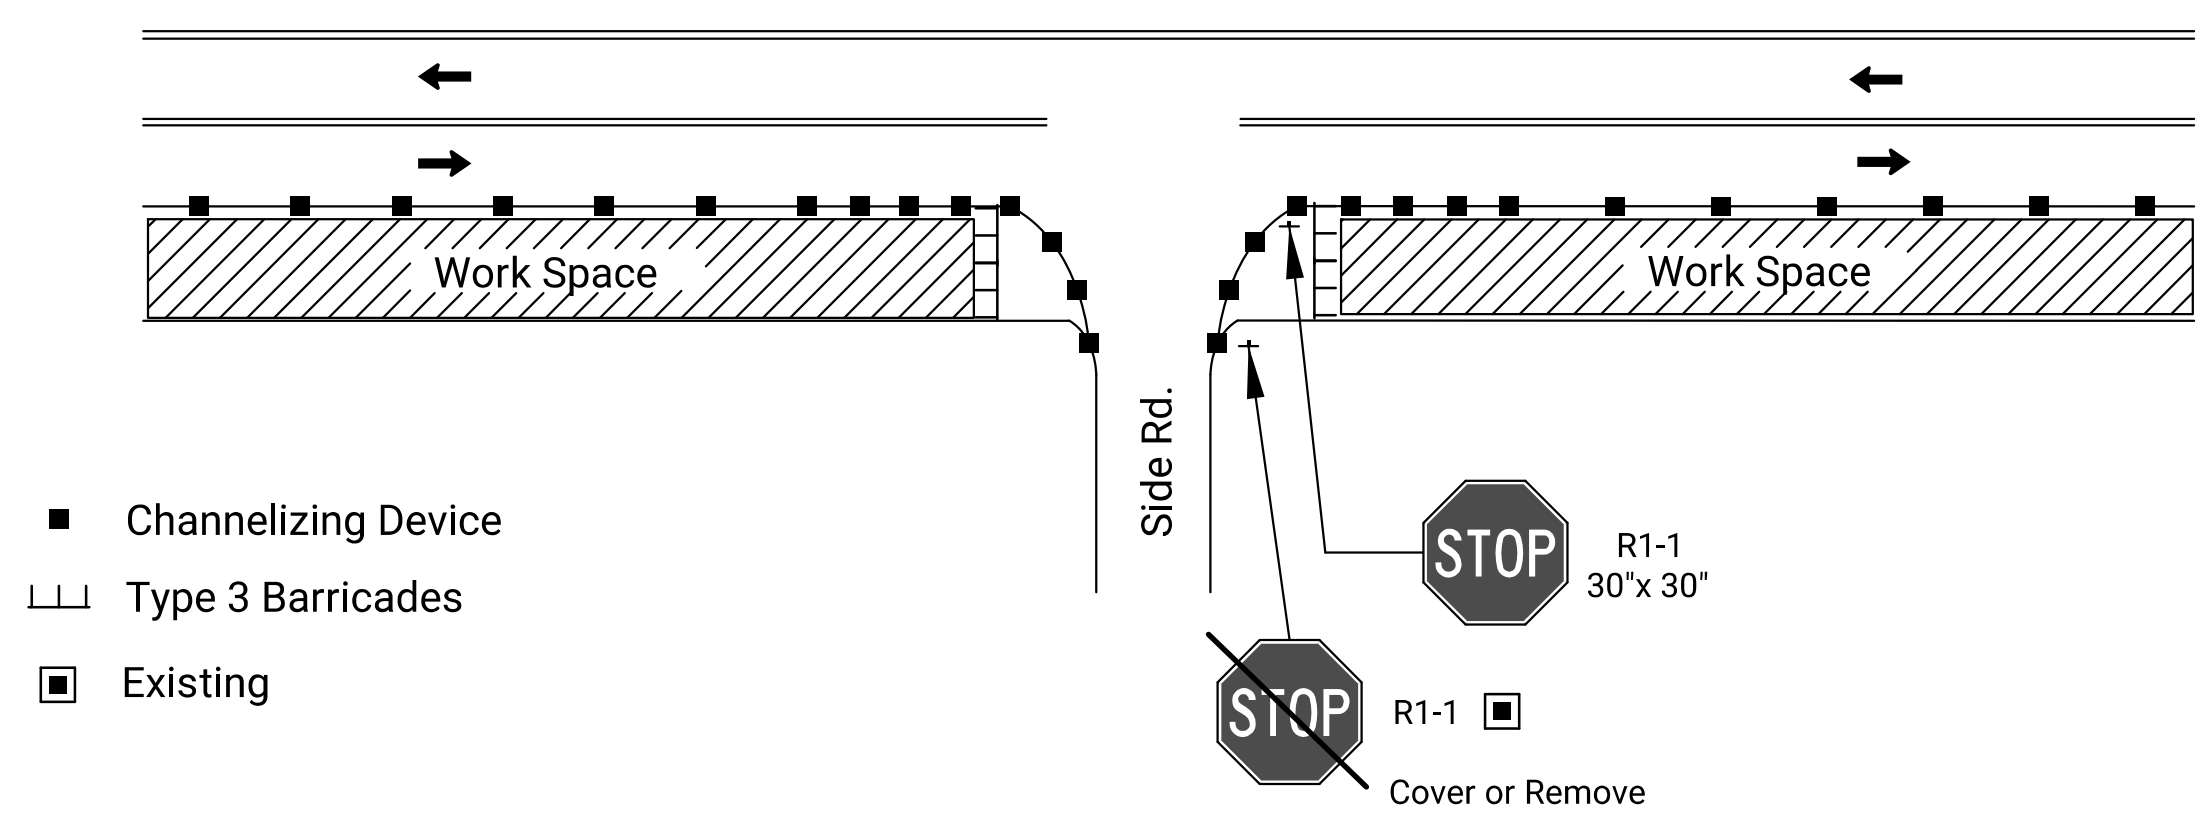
SIDE ROAD OR ENTRANCE OPEN THROUGH WORK AREA
